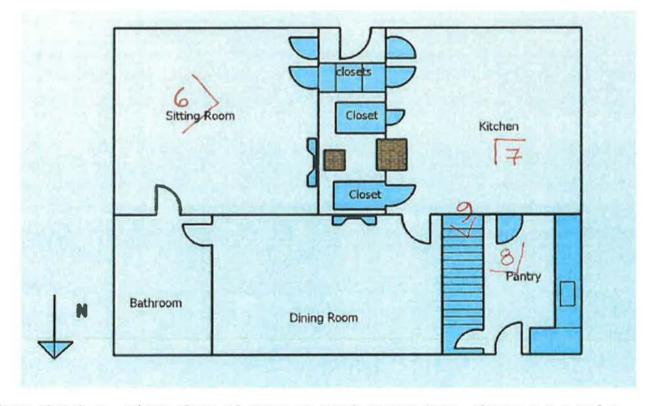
First Floor of House at Marsh Stream Farm. Photos 6,7,8 and 9.
